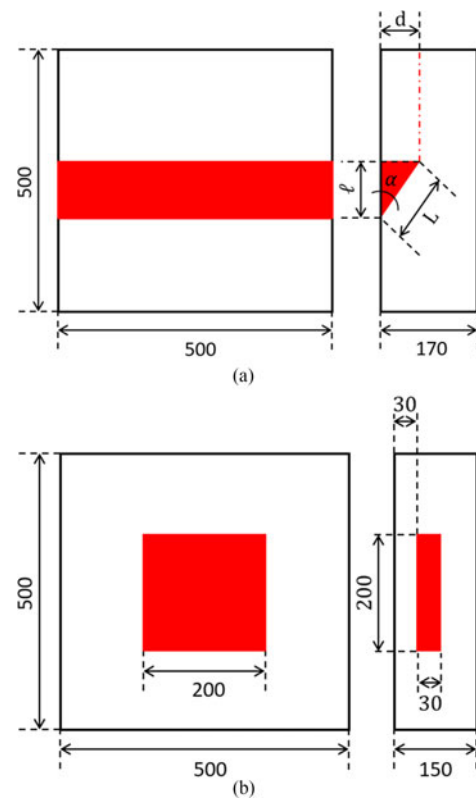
Schematic of concrete test blocks: red area shows defects. Dimensions in mm. (a) Generic schematic of the delamination type concrete test block. (b) Schematic of the void type concrete test block.
